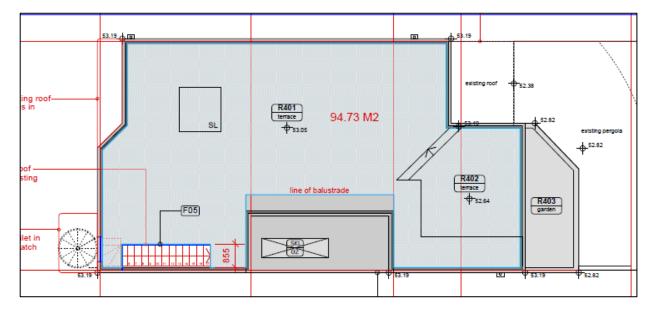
Area of roof terrace proposed under the subject DA. (Source: Dowse Architecture, 2024)
